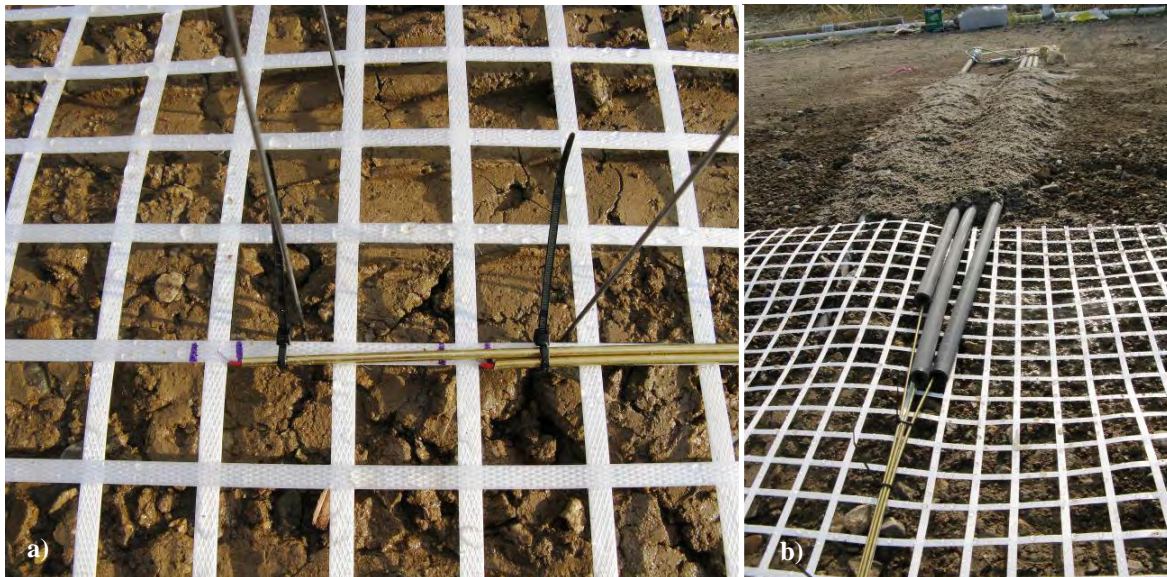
Displacement measurements: a) completed lead wire installation, b) protective tubing.
